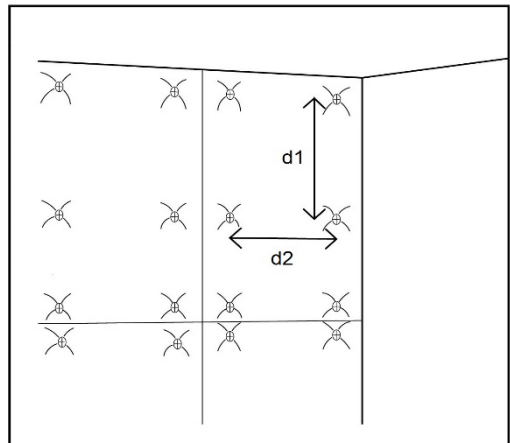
Placing the chamber insulation, vapour barrier and distance between fastening points
